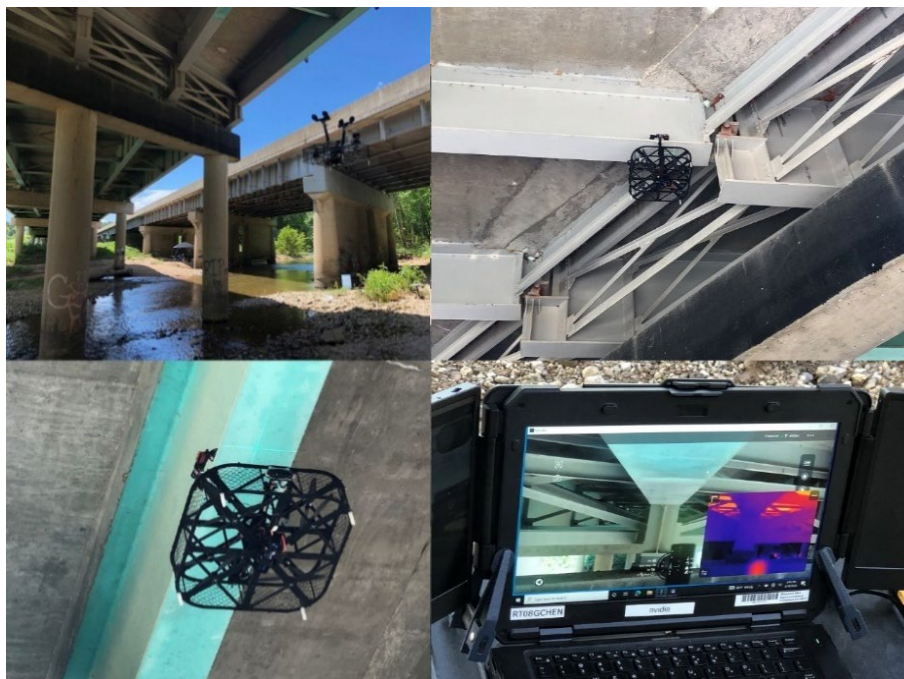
Protective Box Drone Testing on the Rubidoux Creek Bridge in Waynesville, MO
